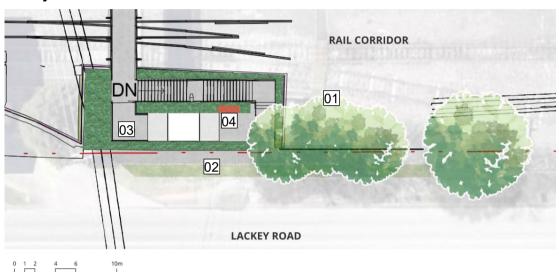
Proposed landscape plan for the Lackey Road access to the station (Source: Architectus, 2023).
